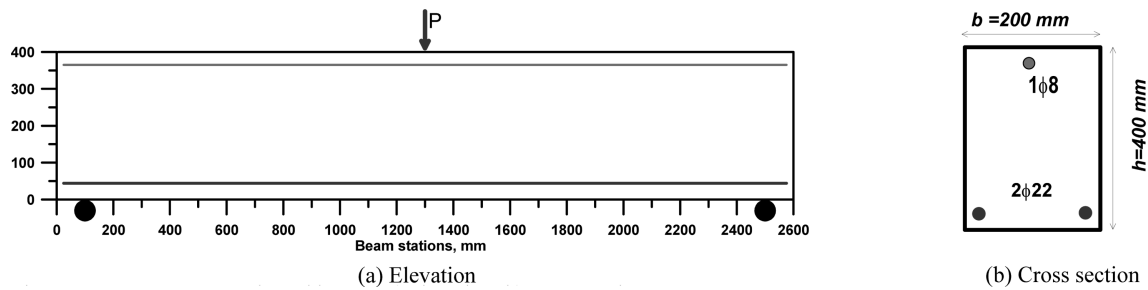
Details of unstrengthened beams (a) elevation, (b) cross section
